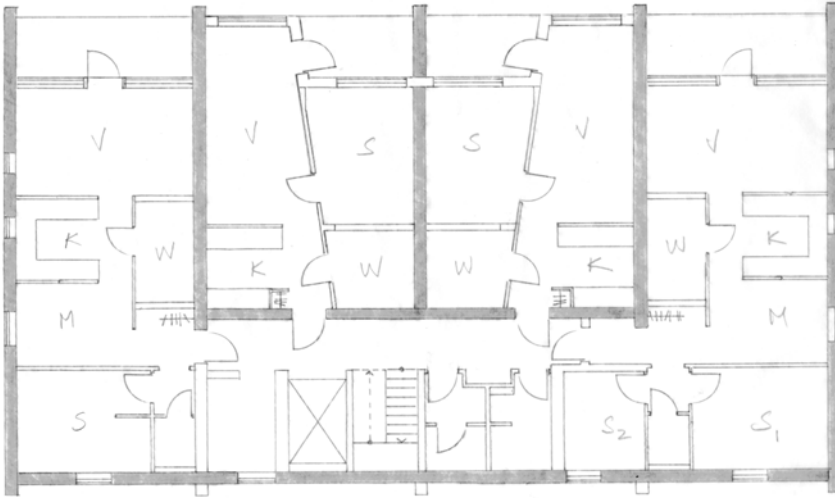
Layout for Sundsvall I, apartment block 1-3.
